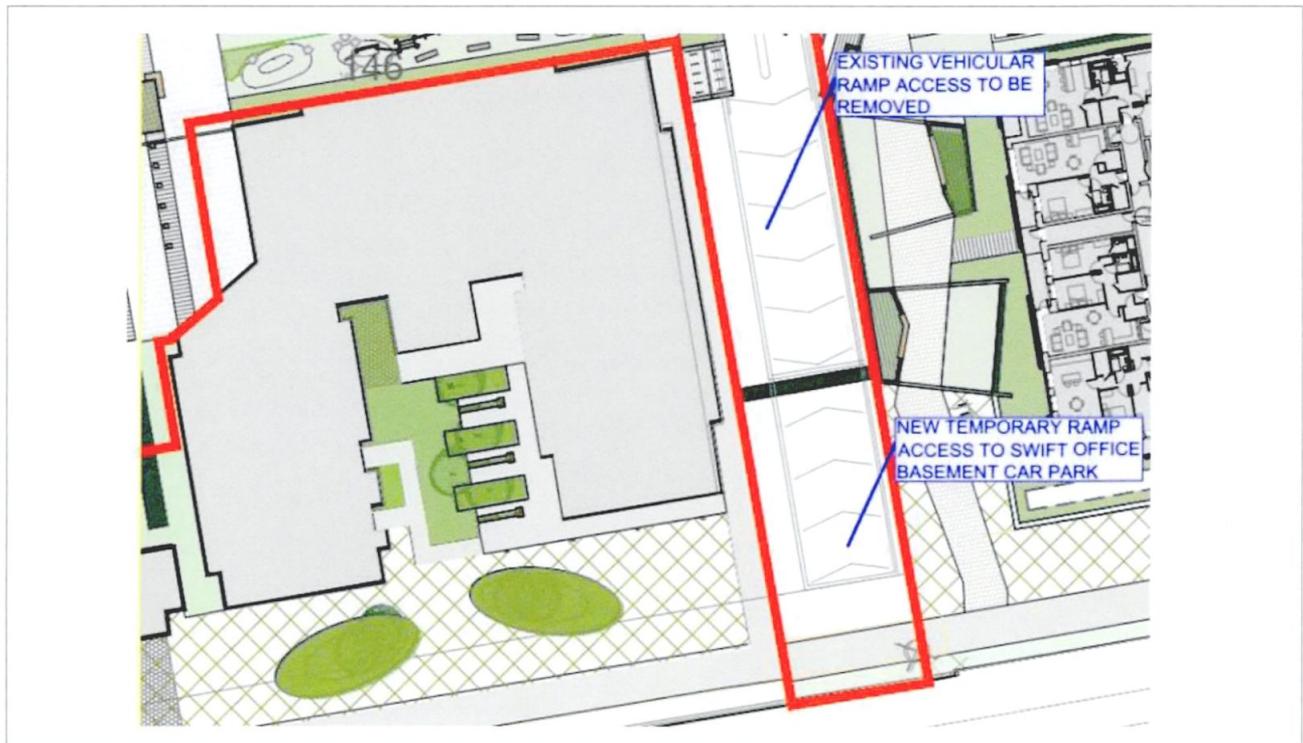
Temporary Access to Existing Swift Basement Car Park
